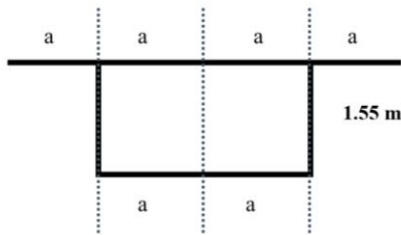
Center to Center Dimensions of Single Cell Box Girder
